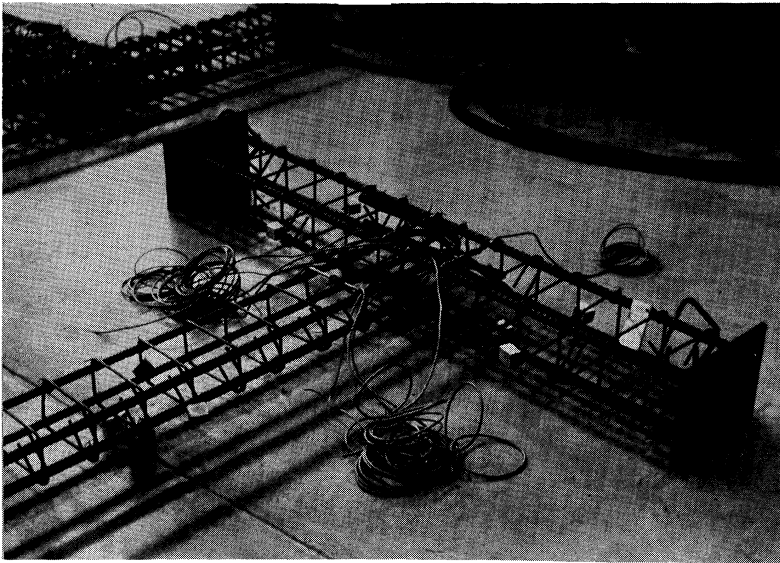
Reinforcement Cage for Beam-Column Specimen
